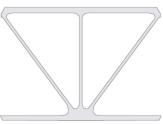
Typical aluminum rib extrusion cross section for use in an aluminum bridge deck panel (23).
